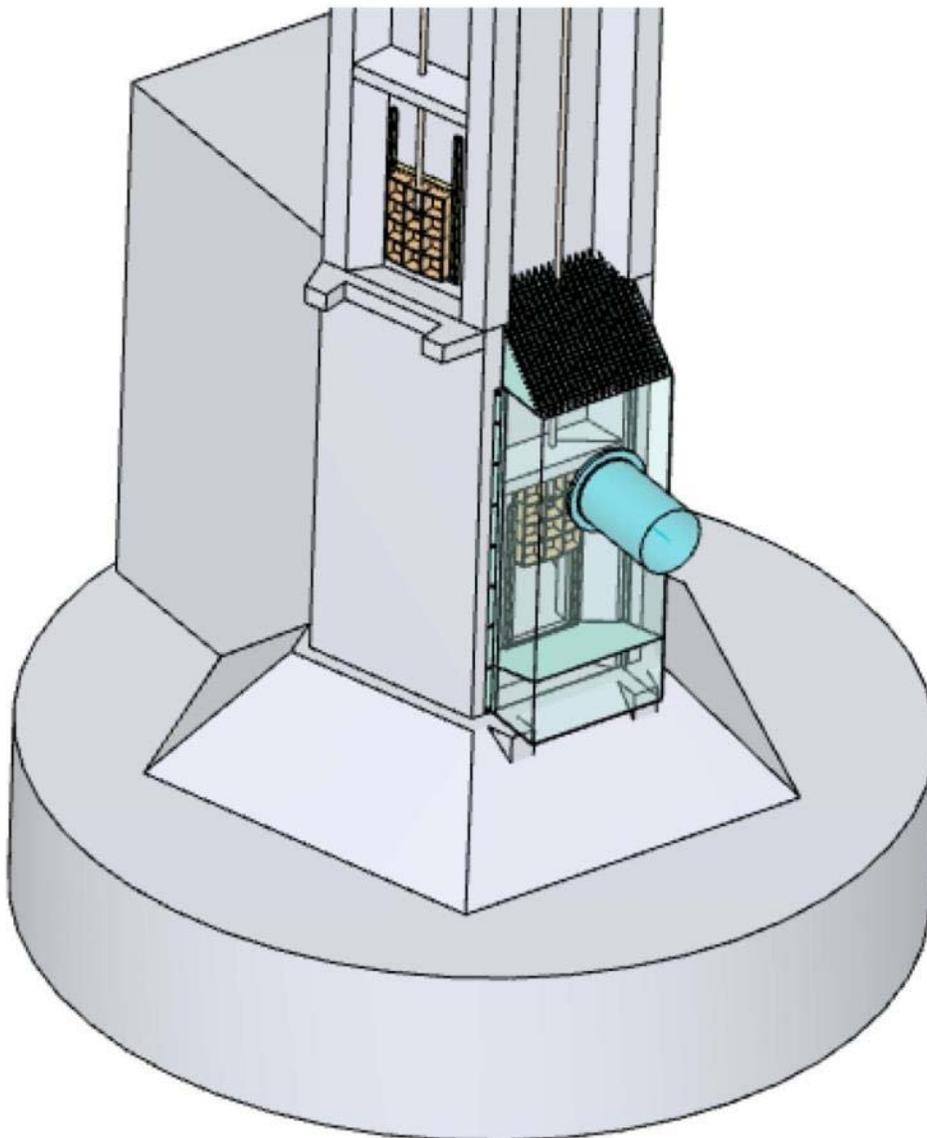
3-dimensional Model of Intake Tower Connection Box
